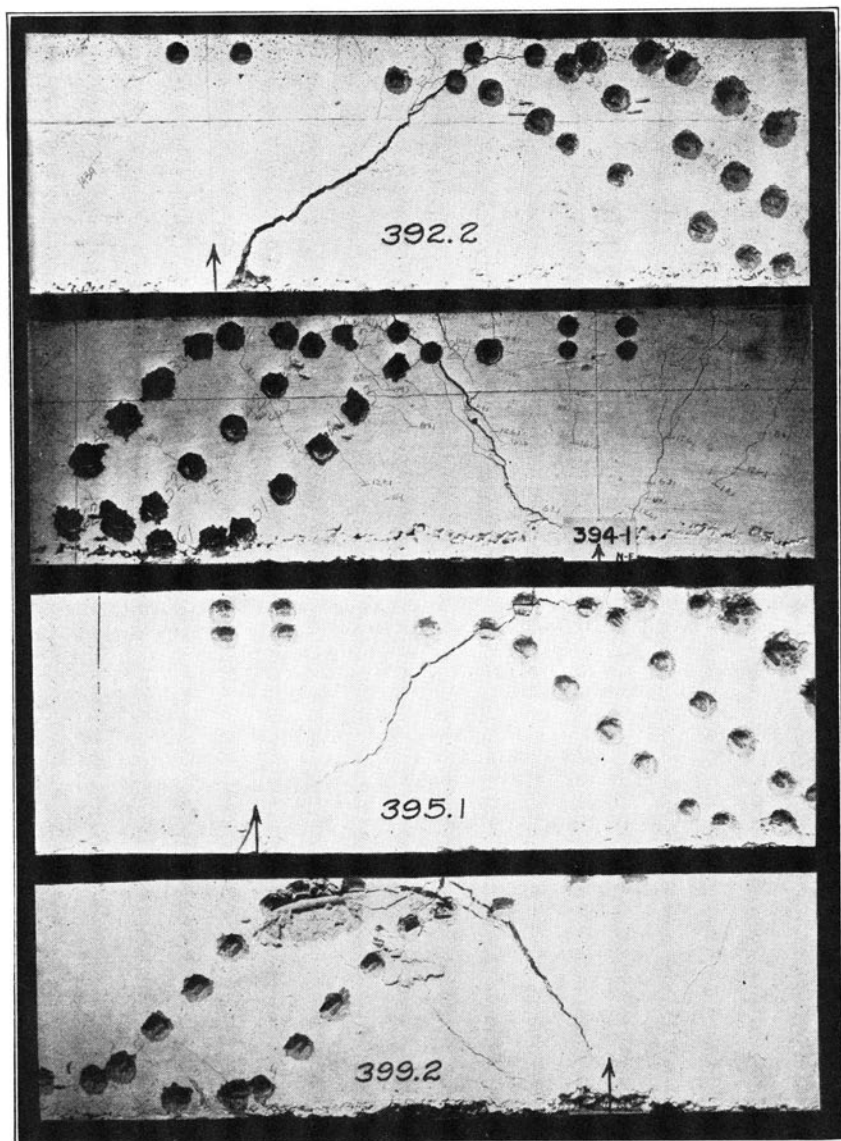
VIEW OF PORTION OF BEAMS 392.2, 394.1, 395.1, AND 399.2 AFTER TEST
